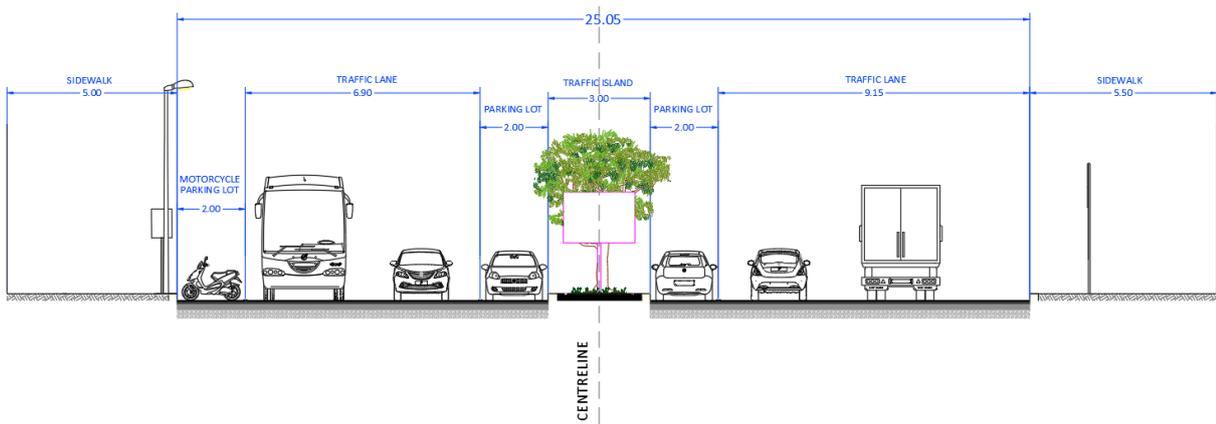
Cross section, section R - R'; road segment of Viale Papa Giovanni XXIII.
